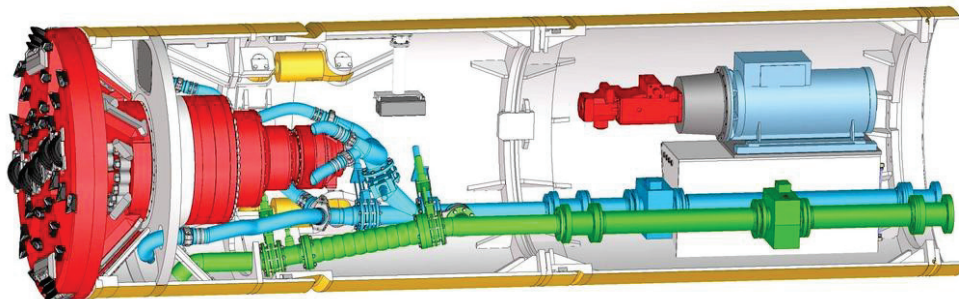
Pipe jacking machine © *Herrenknecht* [107]
